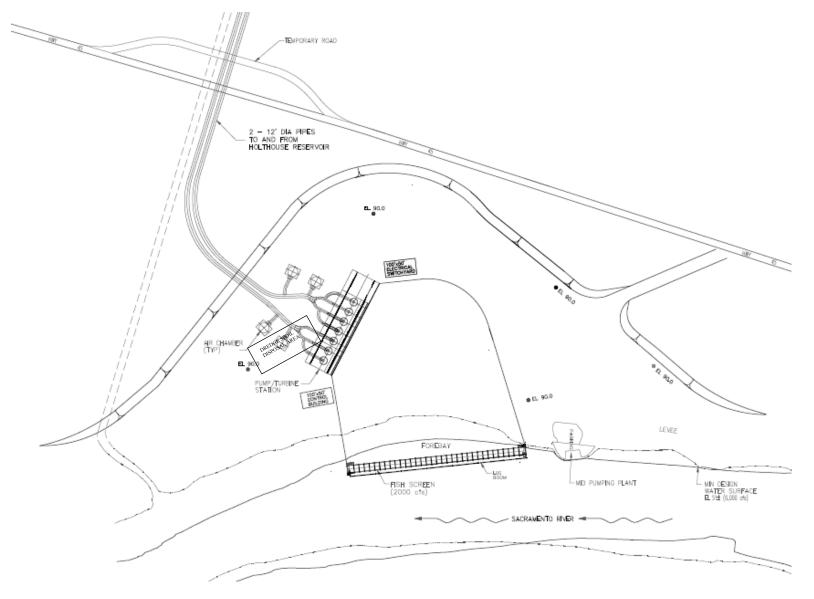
Sacramento River Pumping/Generating Plant Site Layout
